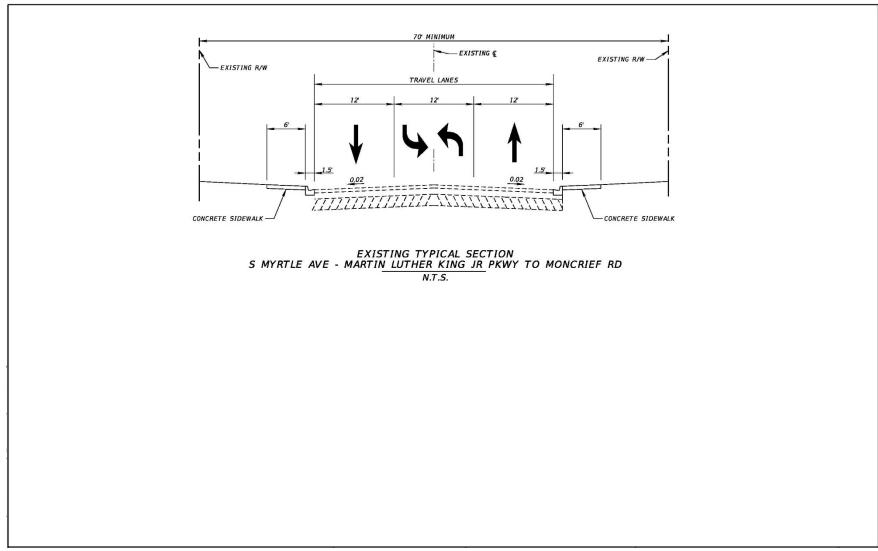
Myrtle Avenue Typical Sections (MLK Parkway to Moncrief Road)
